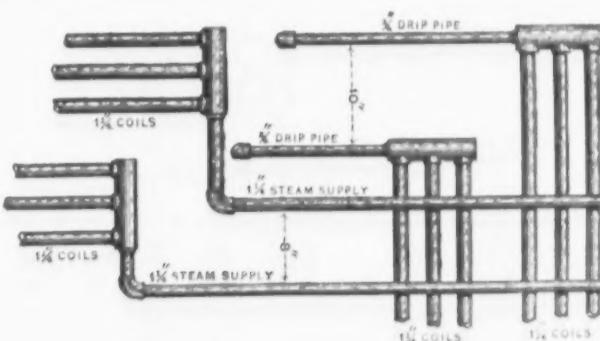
Plan of Connection at B, Stock and Packing Rooms, See Fig. 4.
